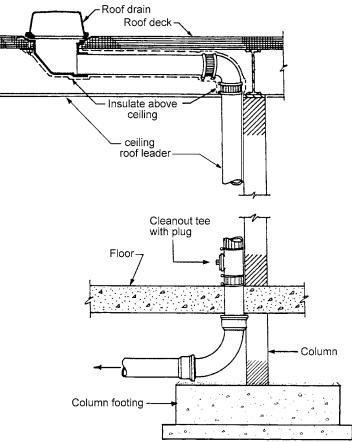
Typical Roof Drain and Roof Leader Source: Reprinted, by permission, from *Cast Iron Soil Pipe and Fittings Engineering Manual* (Cast Iron Soil Pipe Institute, 1976)
